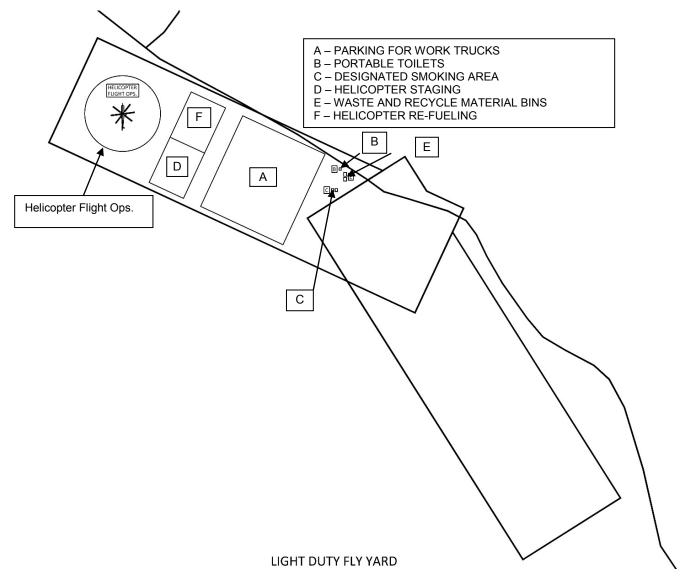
Light-Duty Fly Yard on Pulling and Tensioning Site Layout
